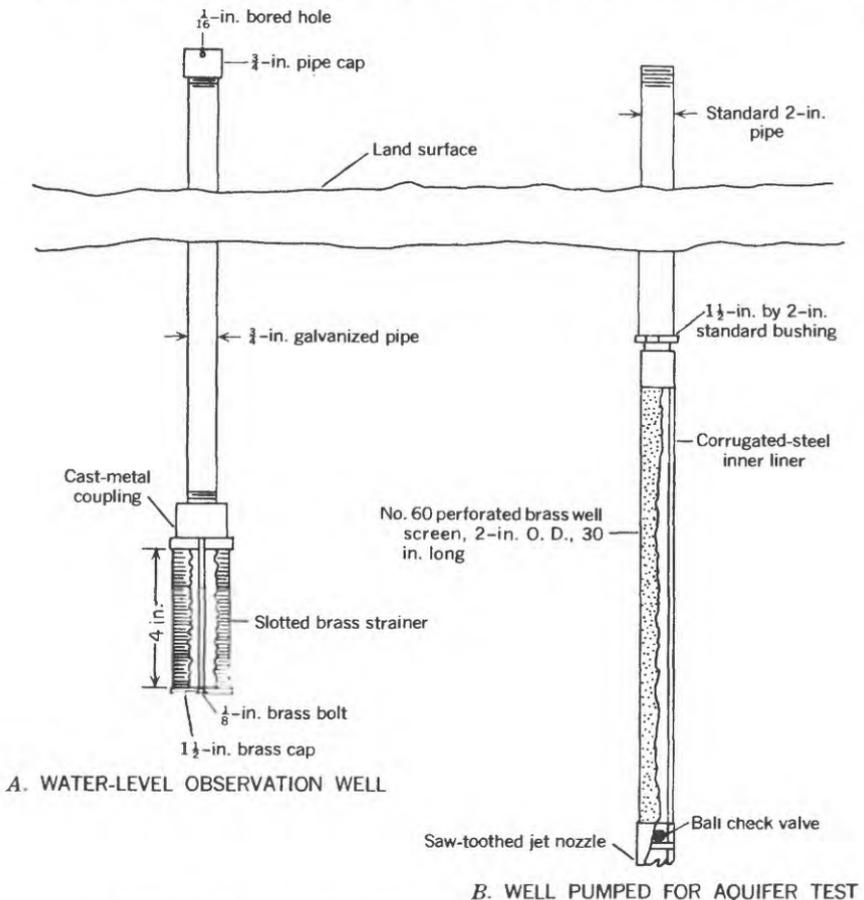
Construction details of test wells installed by jetting equipment.
